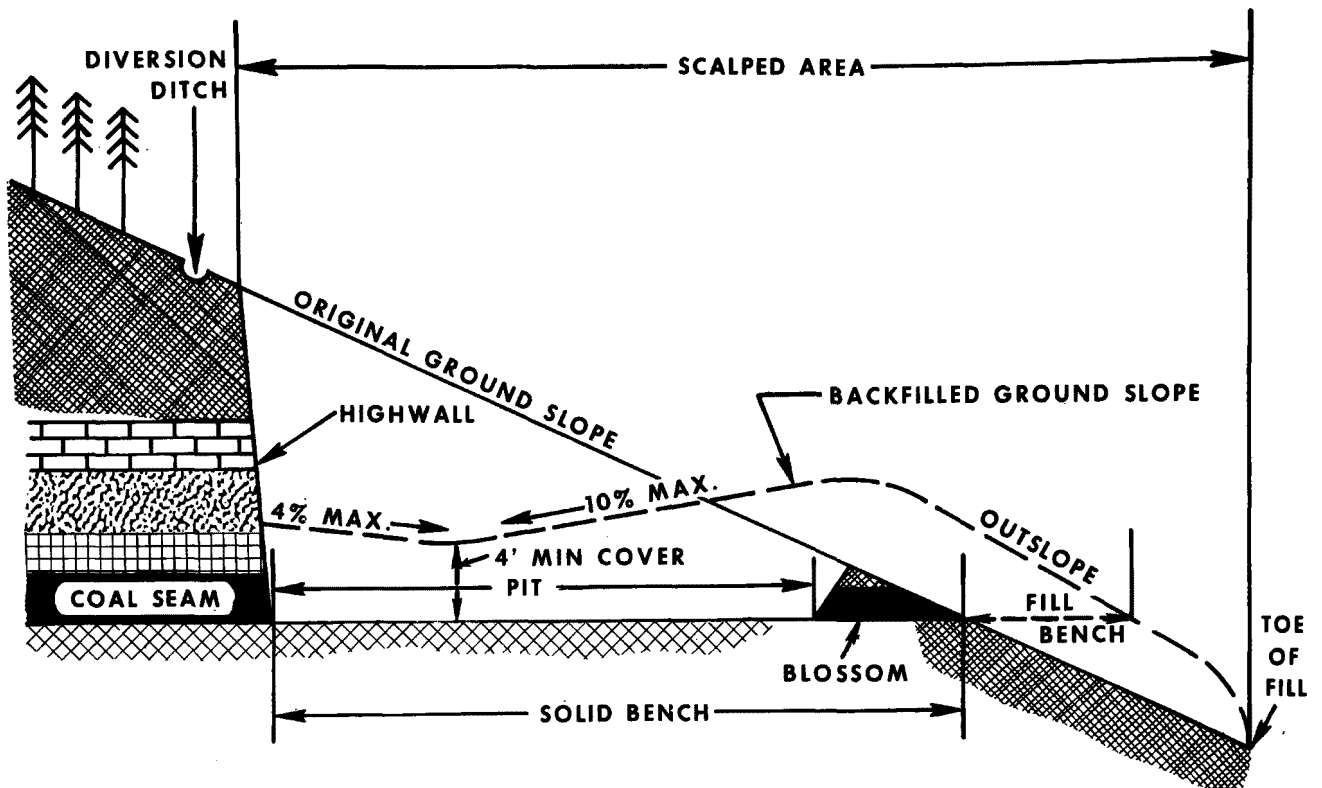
Diagram of typical Georgia V ditch (swallow-tail) backfill, (reduce highwall, if fractured).
